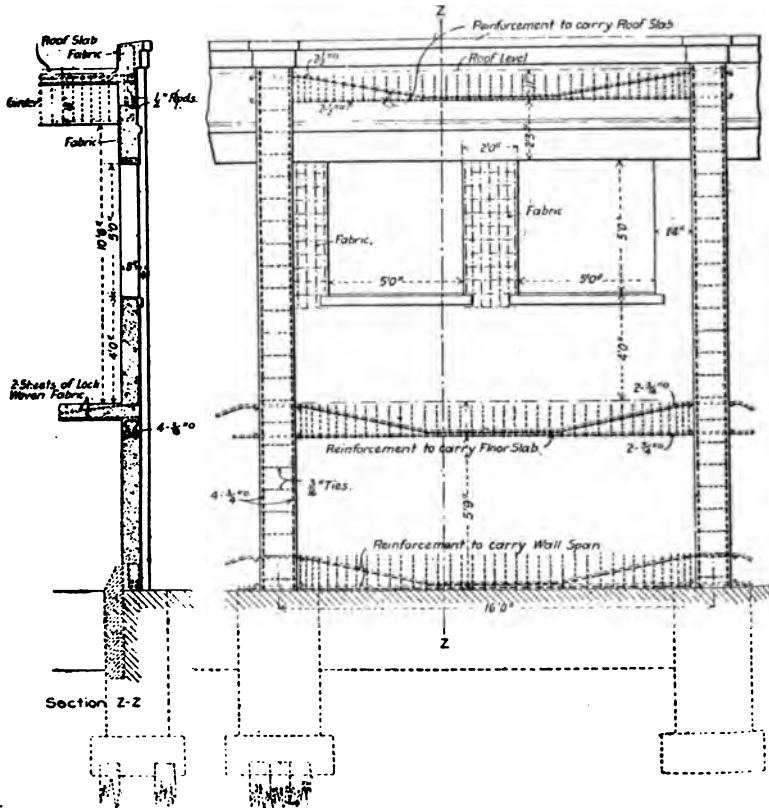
Wall Construction, Central Felt and Paper Co.'s Factory.
